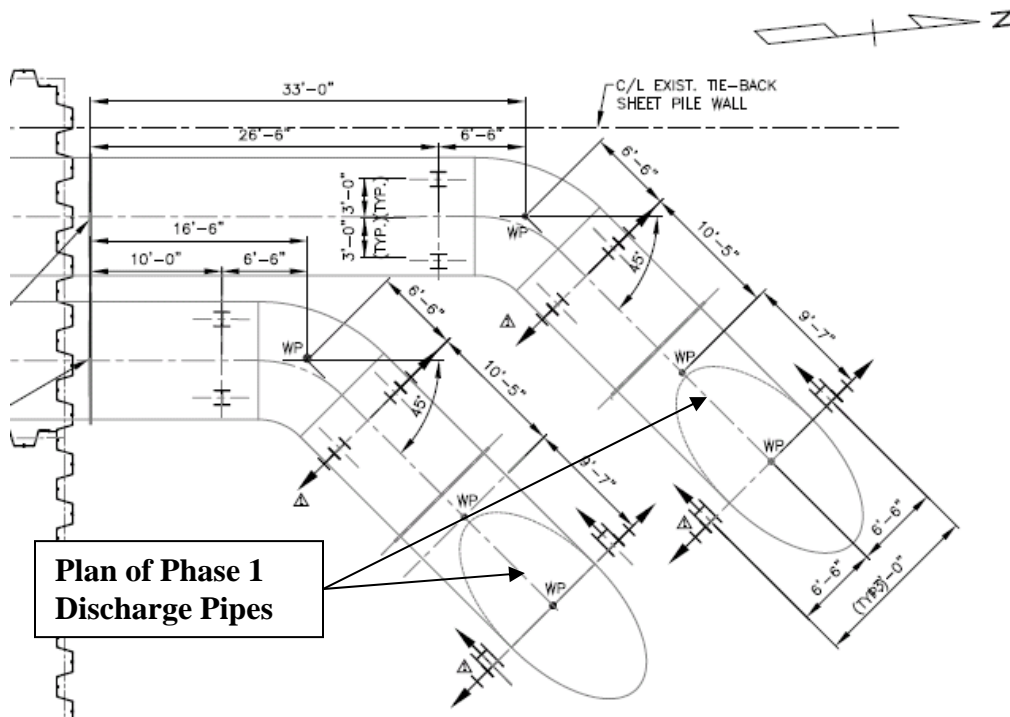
17th Street Discharge Pipe Layout West Bank
